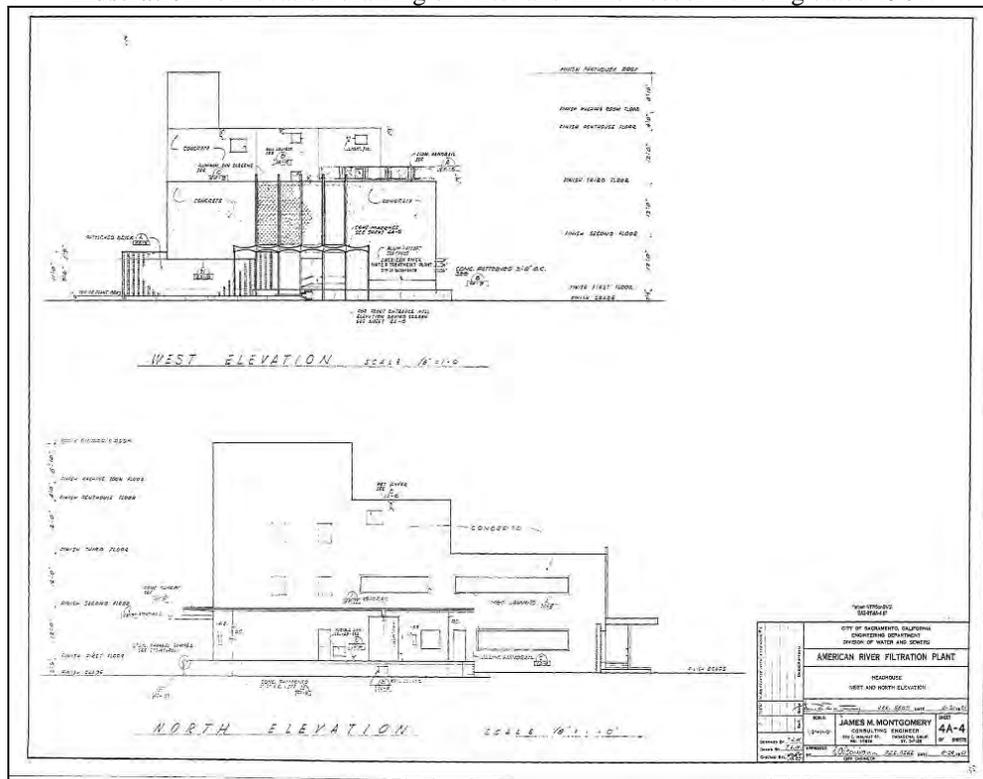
Elevation drawing of Administration Building (formerly known as Head House) dated 1961.
